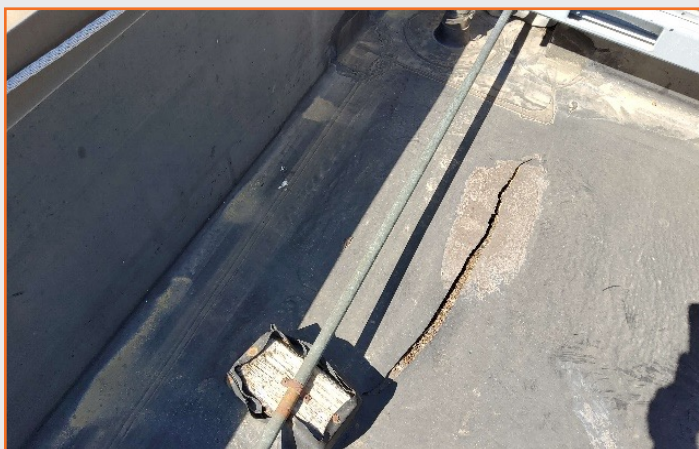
AATT Toll Plaza Electrical Room failed roof.
